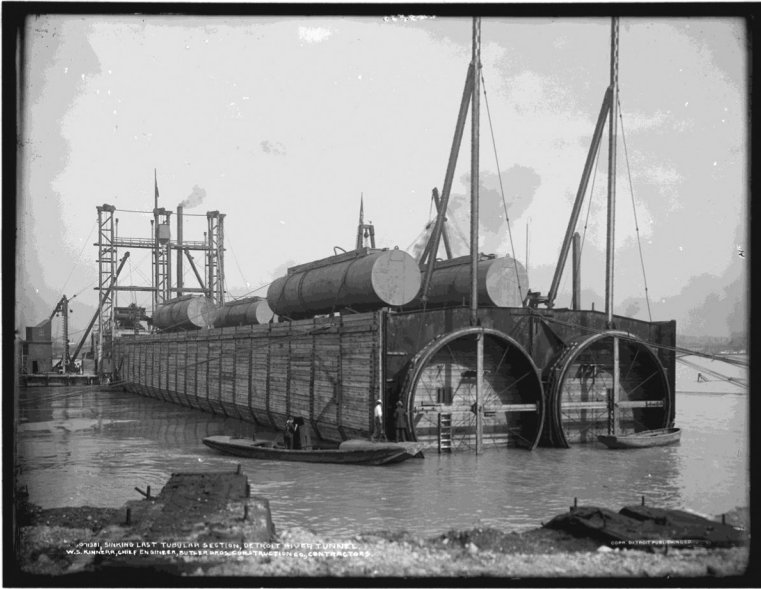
Detroit River Tunnel. (Courtesy of Library of Congress, Prints and Photographs Division, Detroit Publishing Company Collection.)
